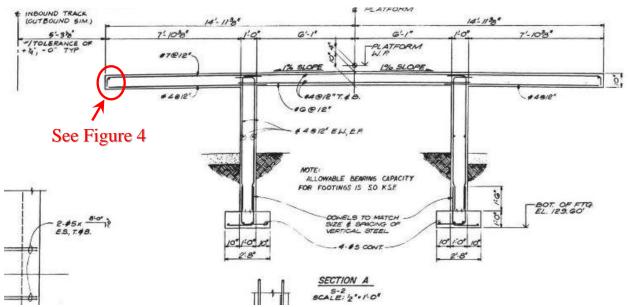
The section shows reinforcing details where Figure 2 existing condition is located.
